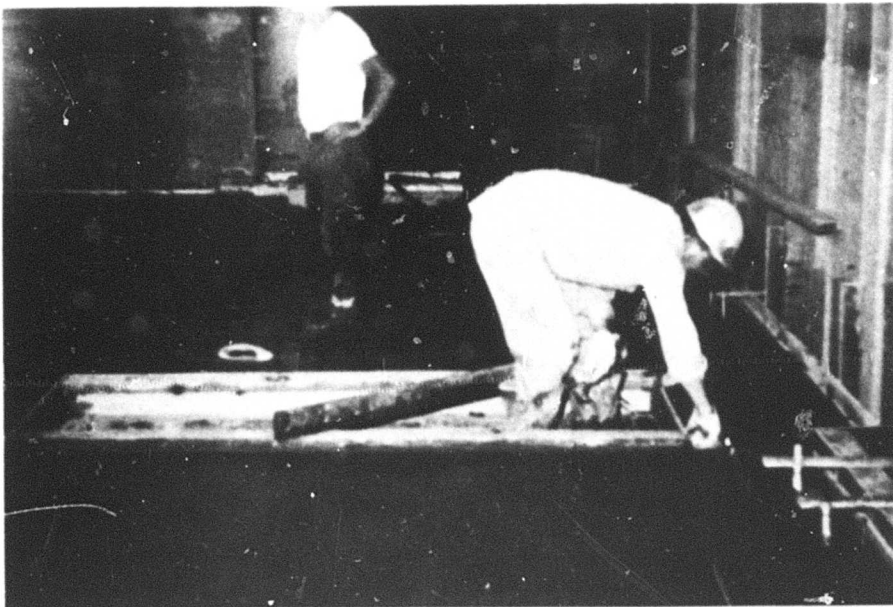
Six Inch Wirand Floor In Rock Island Arsenal Building
